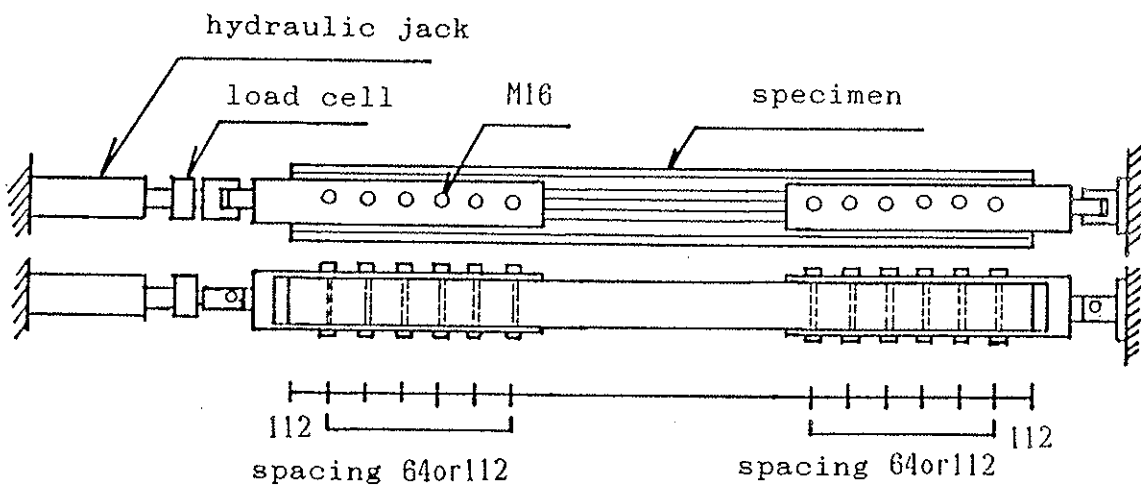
Apparatus for the shear test of the bolted joints having the multiple bolts
